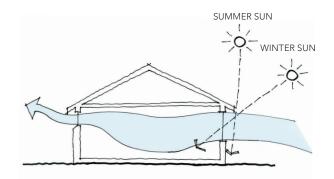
Provide cross ventilation with operable windows on opposite sides of the house
